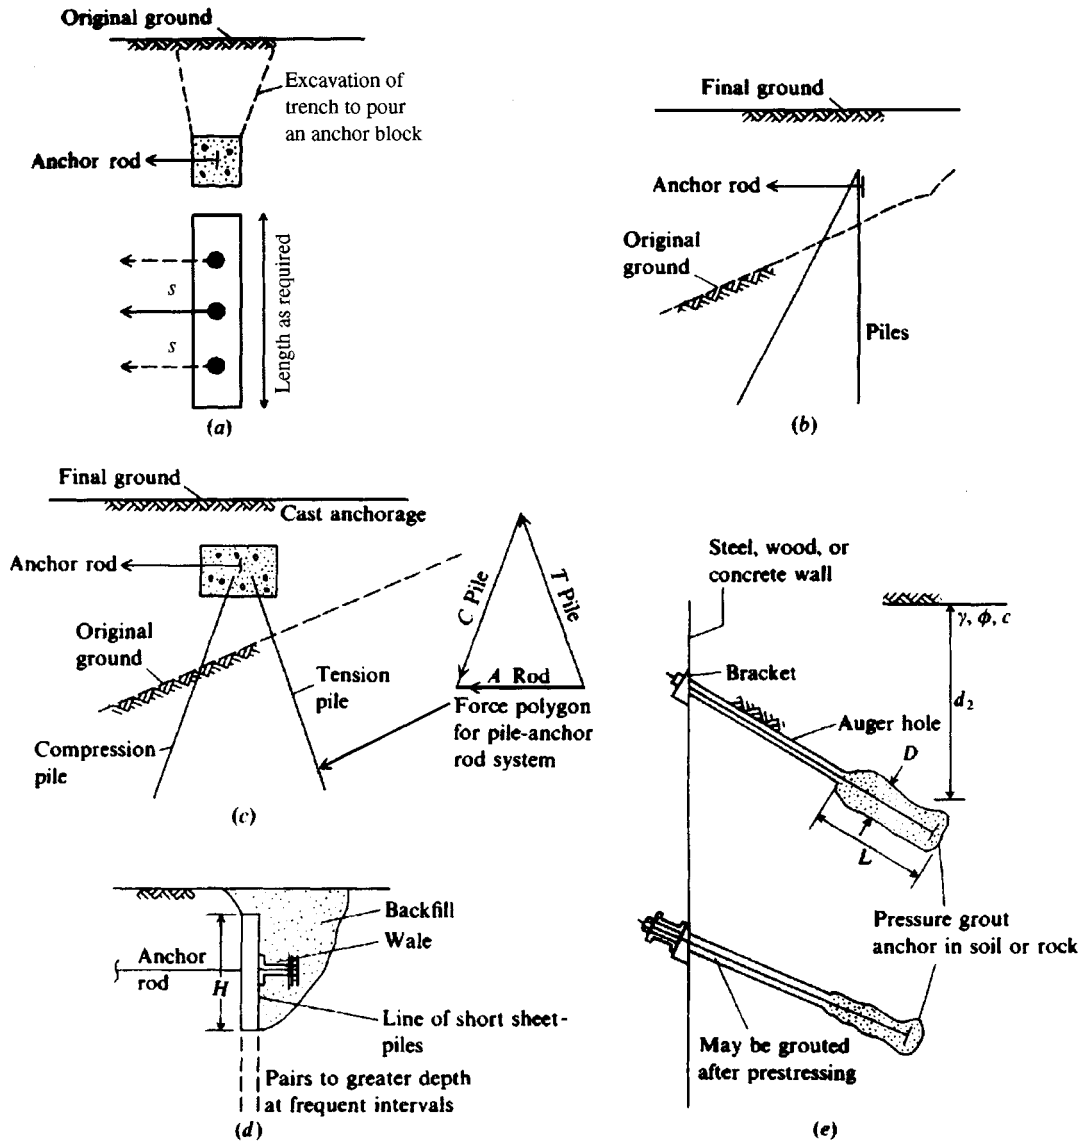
Sheet pile anchorages: (a) Cast-in-place anchor block; (b, c) pile configurations used as anchorages; (d) short sheet-pile wall used as anchorage; (e) tie-back anchor.
